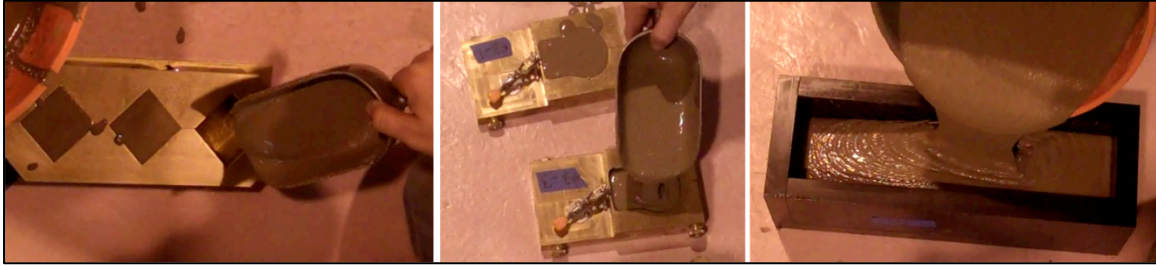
Casting cubes, single fiber pull-out specimens and beams
